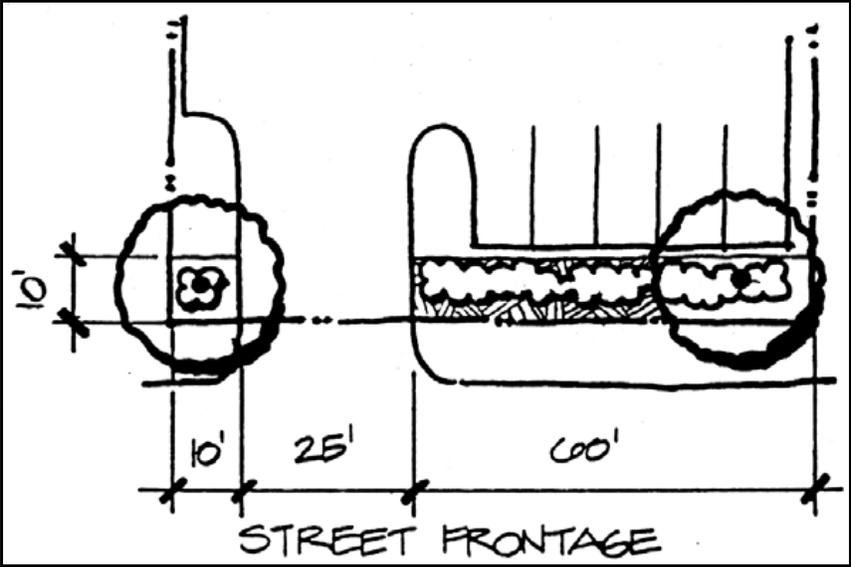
Parking Lot Landscaped Strip, Option 1
